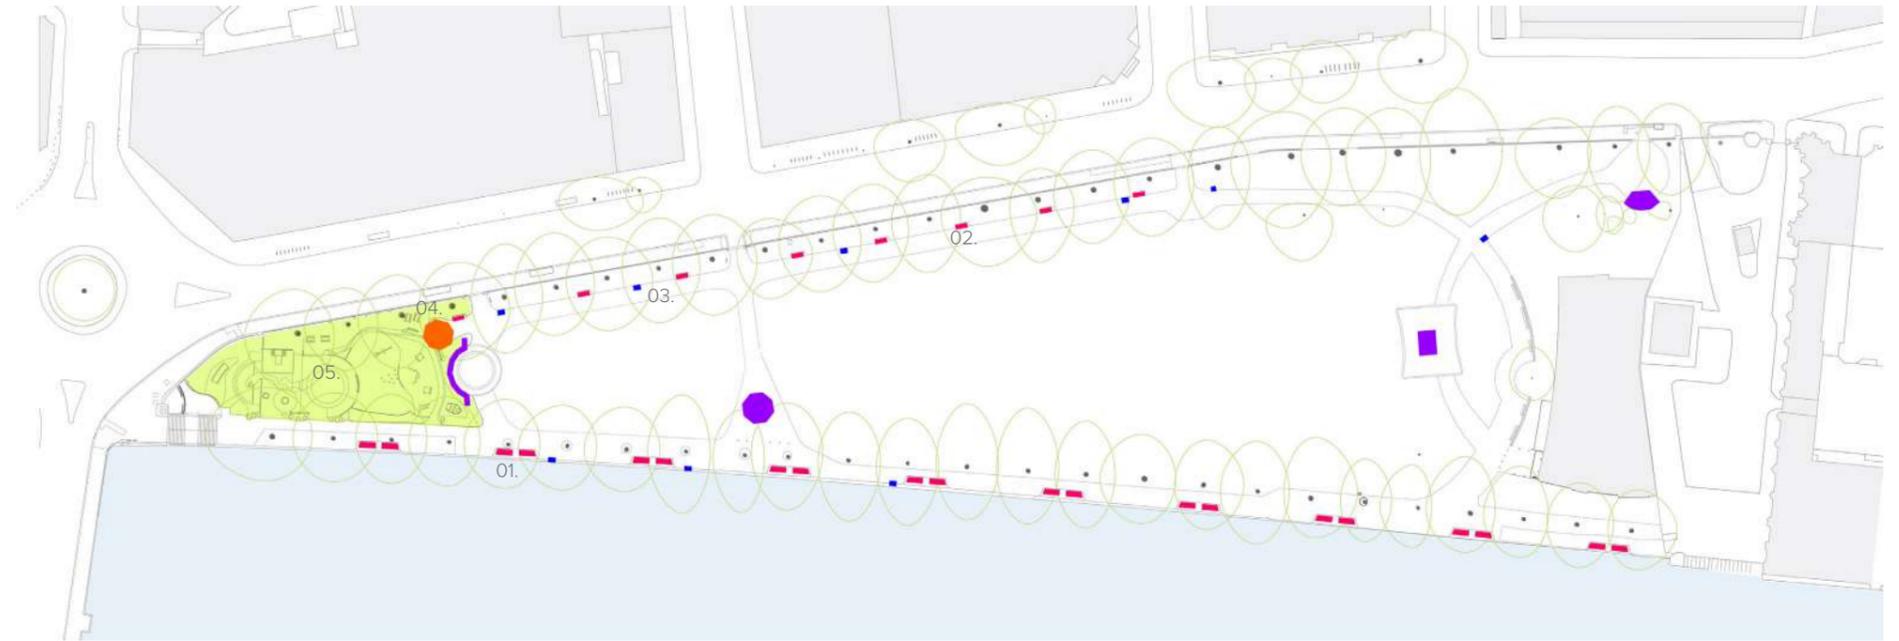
LOCATION PLAN OF EXISTING FEATURES
